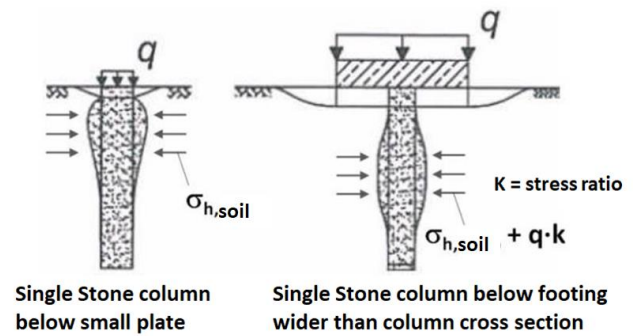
The triaxial conditions of stone columns below foundations and plate load tests.
